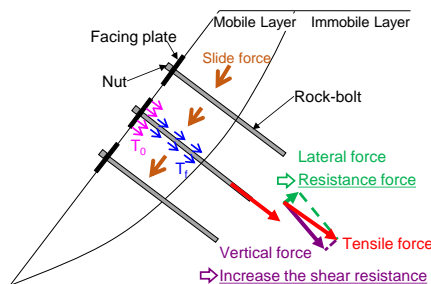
Reinforcement mechanism of rock-bolt with facing plate
